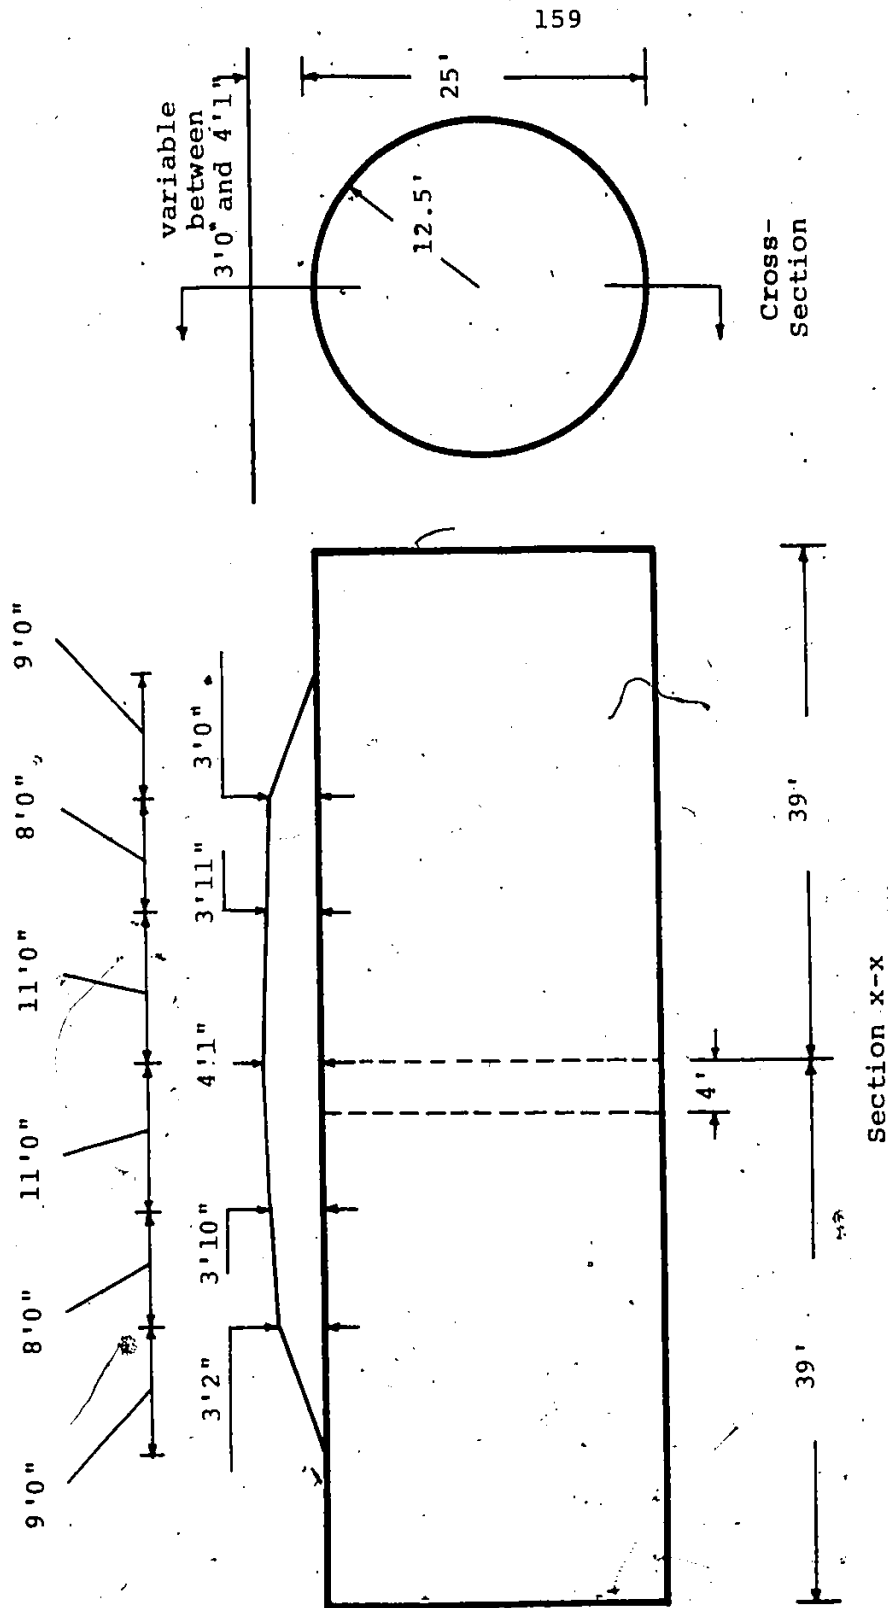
Details of White Ash Creek soil-steel structure.
